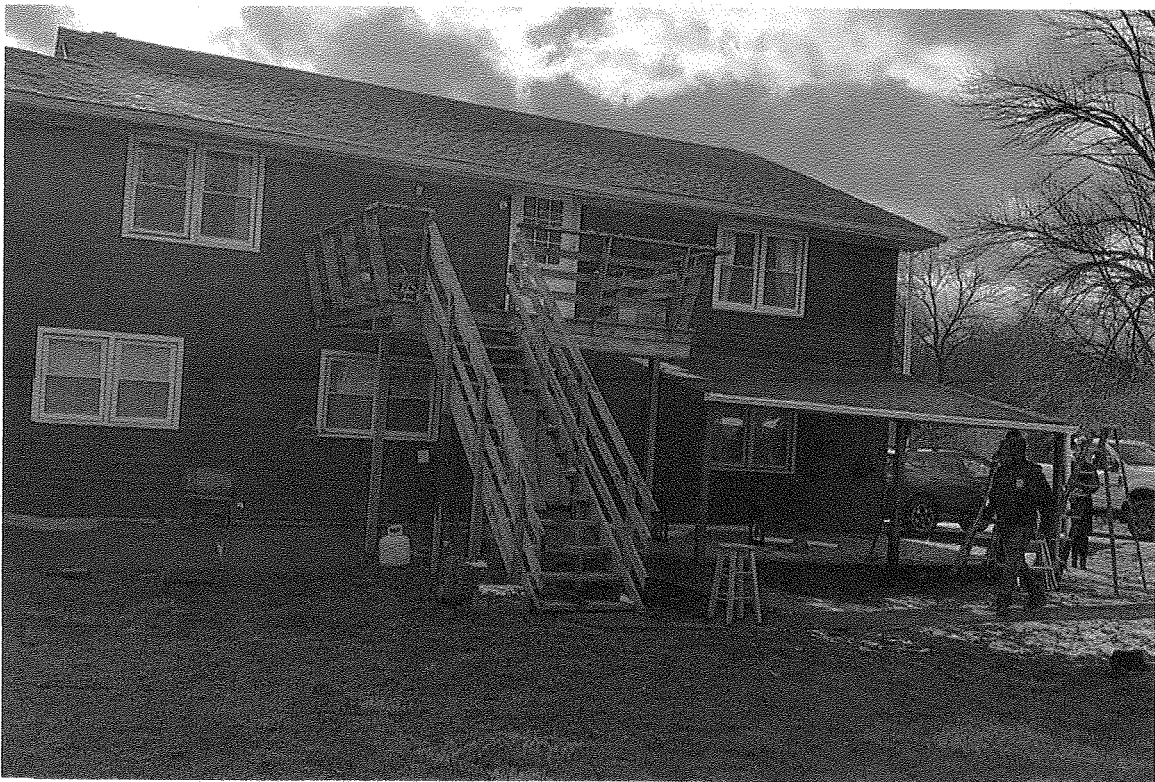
NORTH SIDE OF RESIDENCE, DECK ACCESS TO SECOND STORY & NORTH ACCESS TO GROUND FLOOR UNIT
